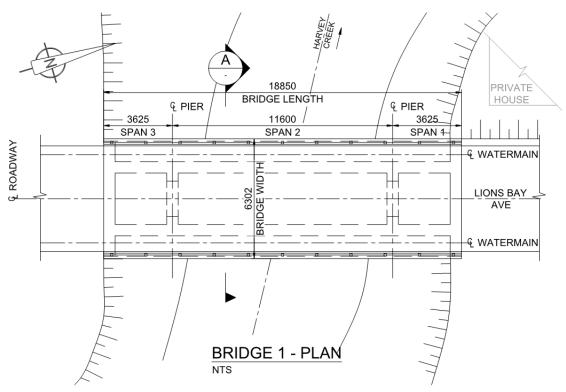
Lions Bay Avenue Bridge Over Harvey Creek – Plan
